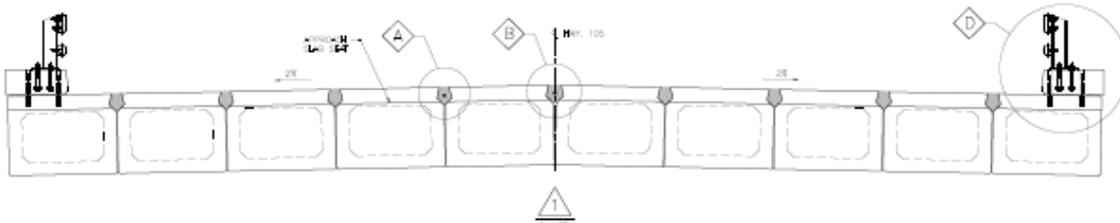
Typical cross section of side-by-side box girders with UHPC Joint Fill
